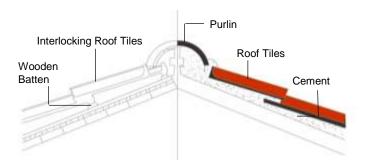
Common roof tile system vs roof tile system in *Istana Bandar*.
